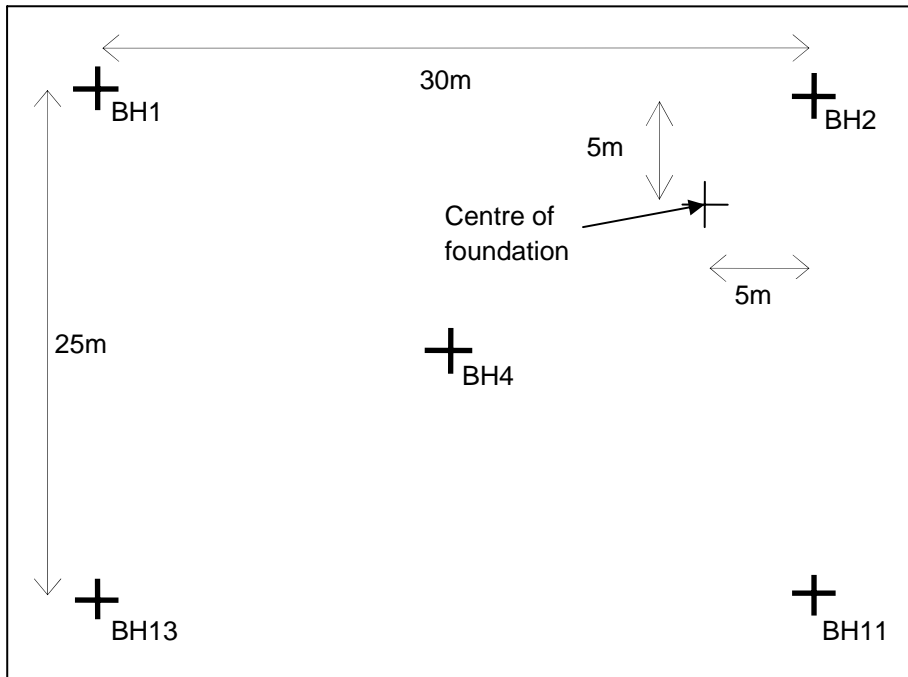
Example 2.2 Site plan and location of SPT tests
